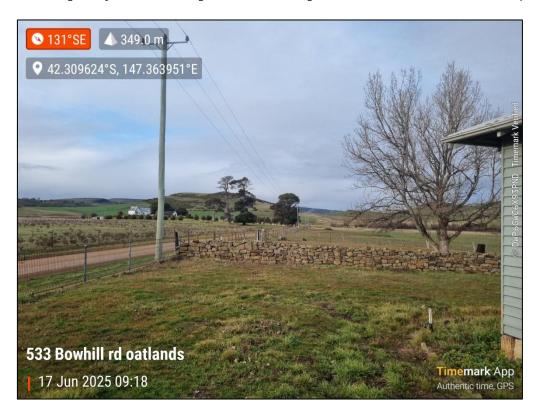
Looking Southeast from the existing habitable building site at 533 Bowhill Road -Across slope
